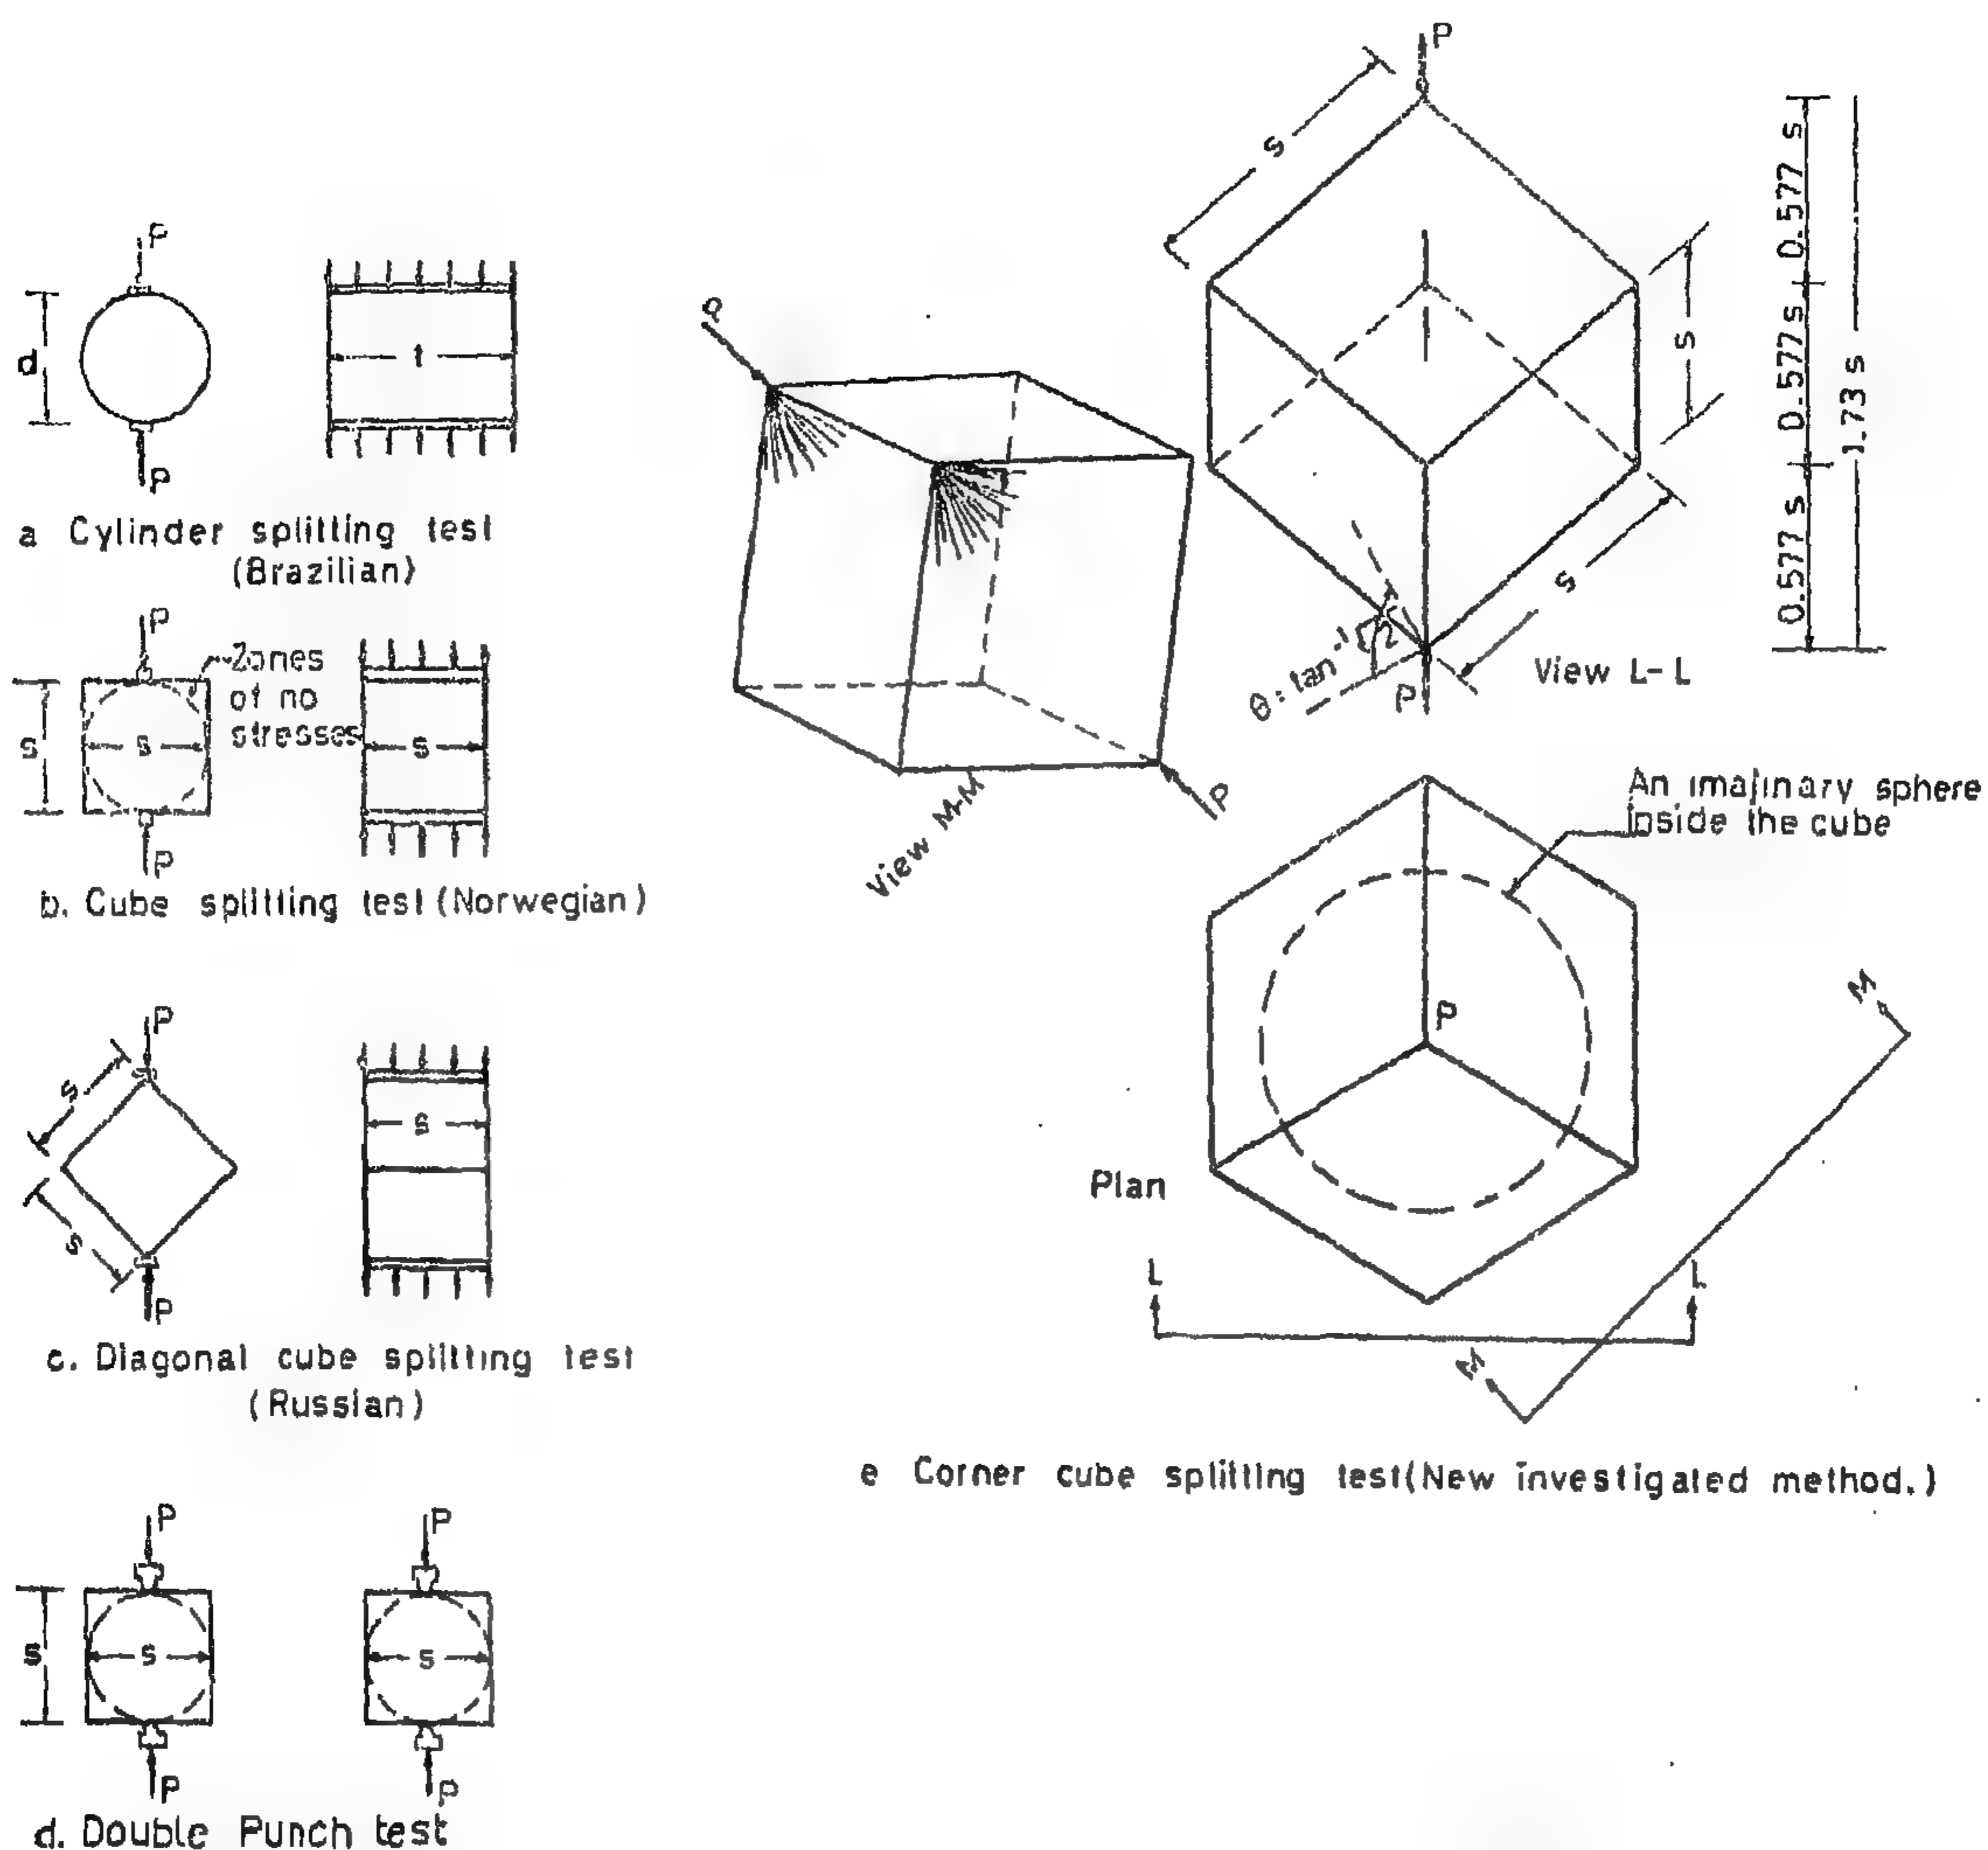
POSSIBLE WAYS OF CARRYING OUT SPLITTING (INDIRECT TENSION) TESTS ON CONCRETE SPECIMENS.
